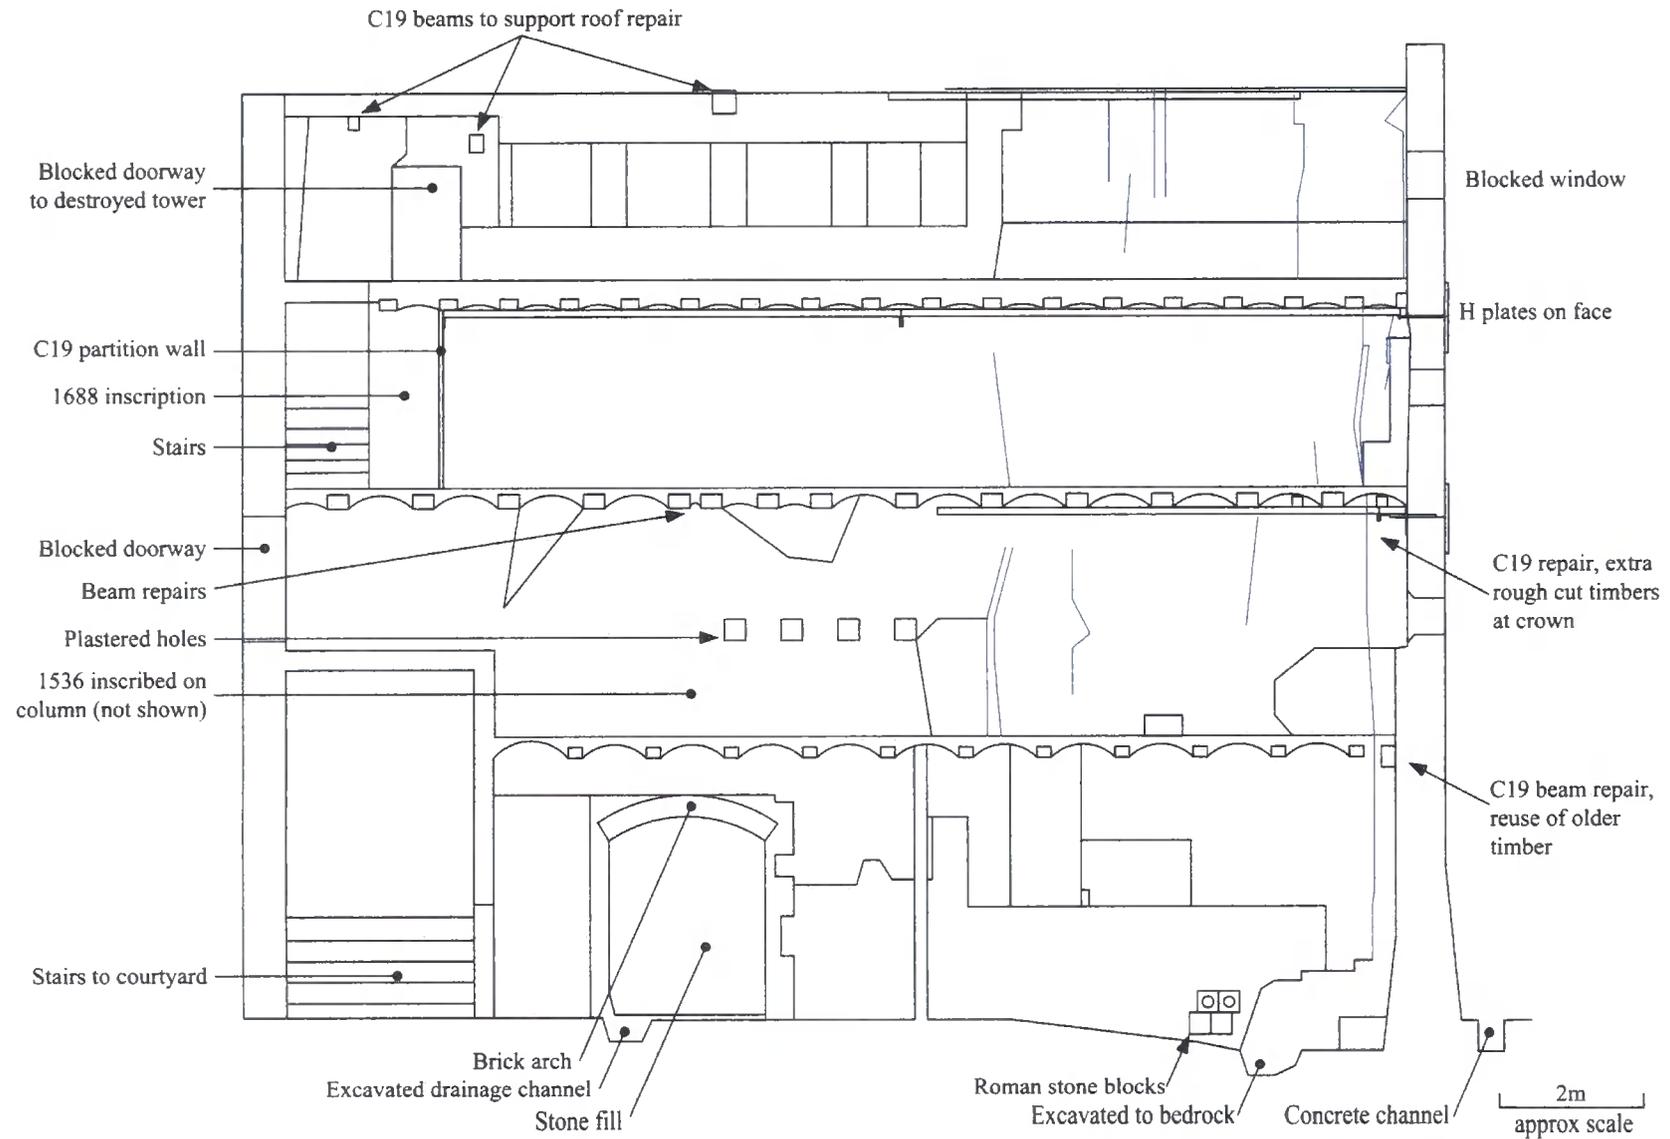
Am1 Ambel north east tower east face elevation internal of the east wall, here inverted to match the external elevation. Cracks shown in blue
